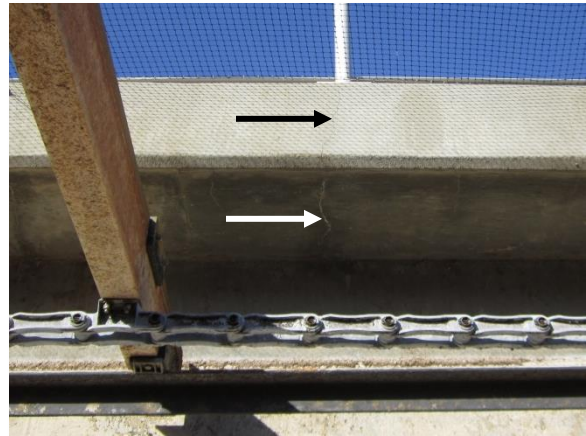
Minor cracking of walkway above north wall of SST 2.
